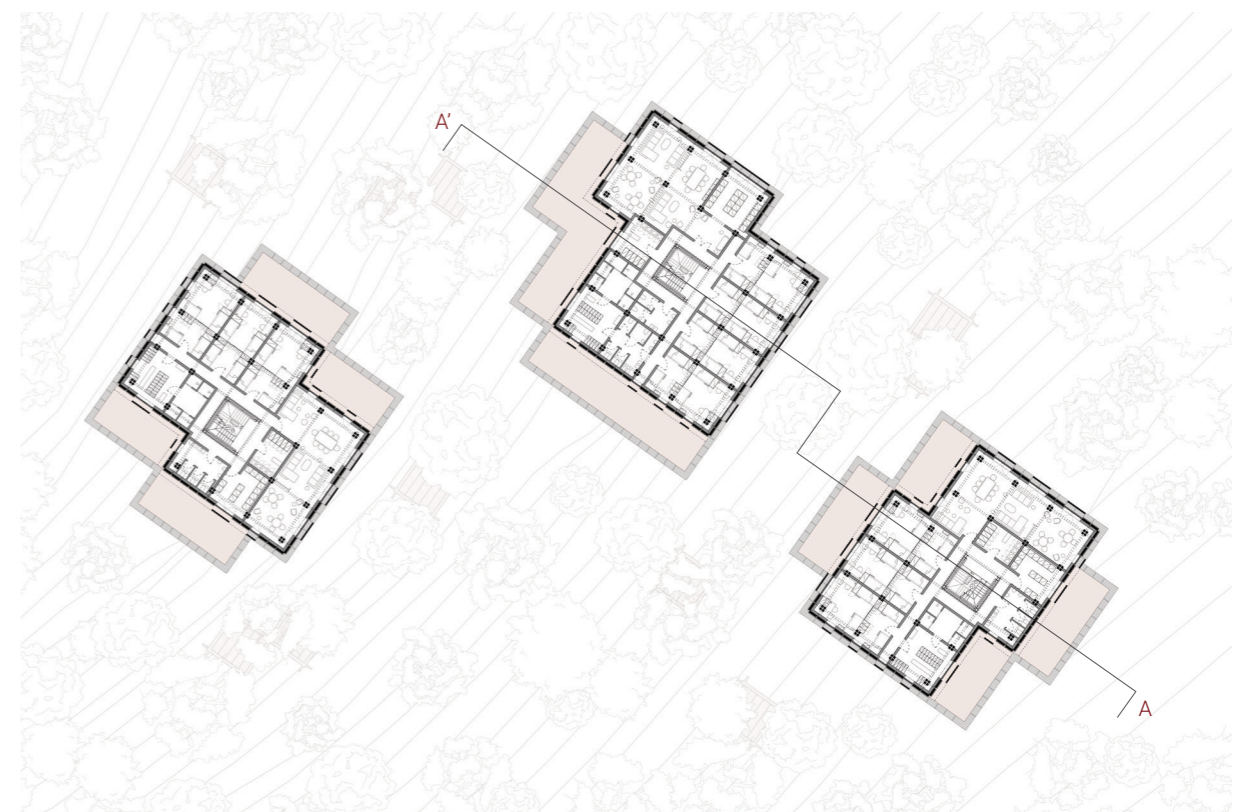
Ground floor and Second floor plans of a during conflict phase cluster.
